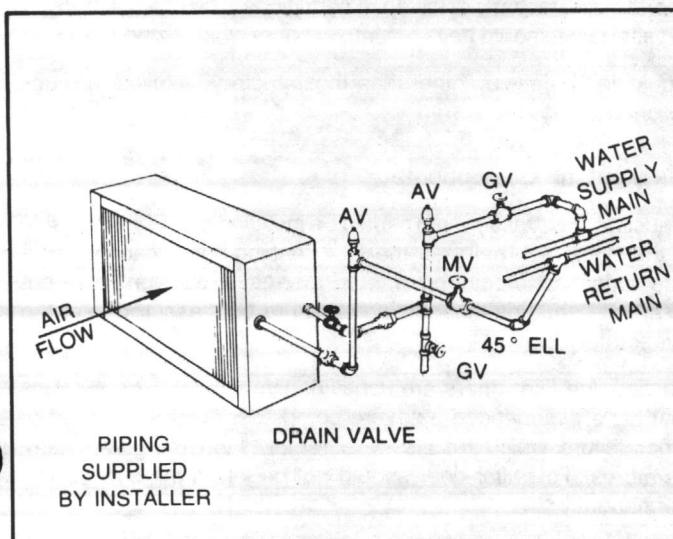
Typical Piping for Type W, Two-Row Water Coil
